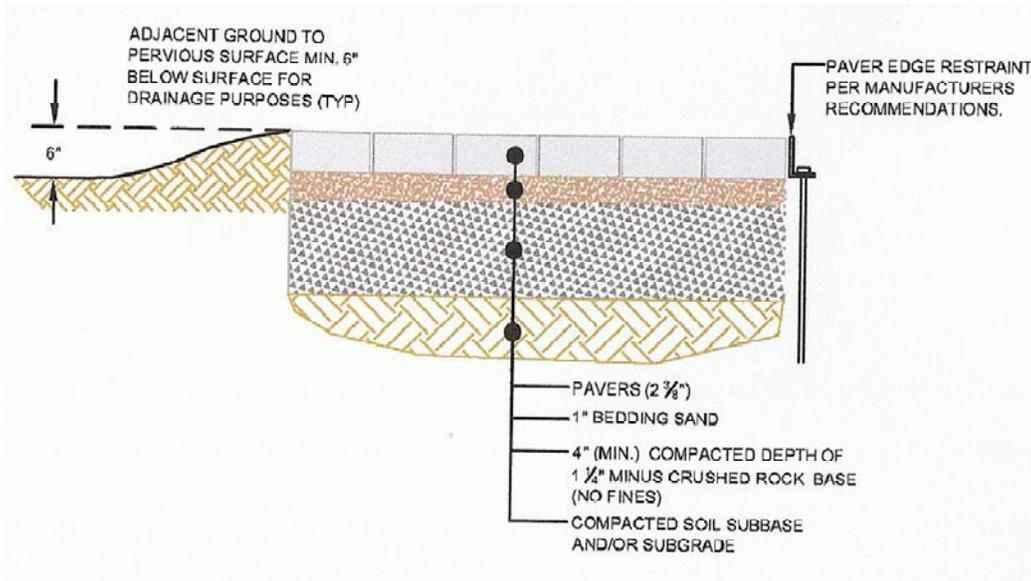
Typical Pervious Paver section for sidewalk or patio. Vehicle bearing installations would typically have thicker base courses. Source: 2020 Engineering 2008
